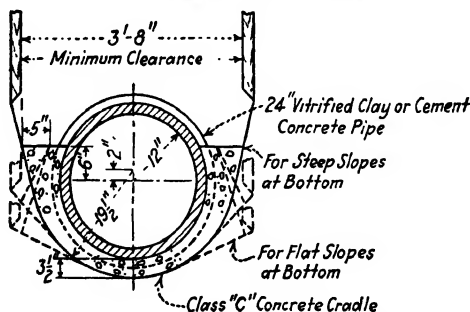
Concrete cradle for 24-in. pipe sewer, Louisville, Ky.
